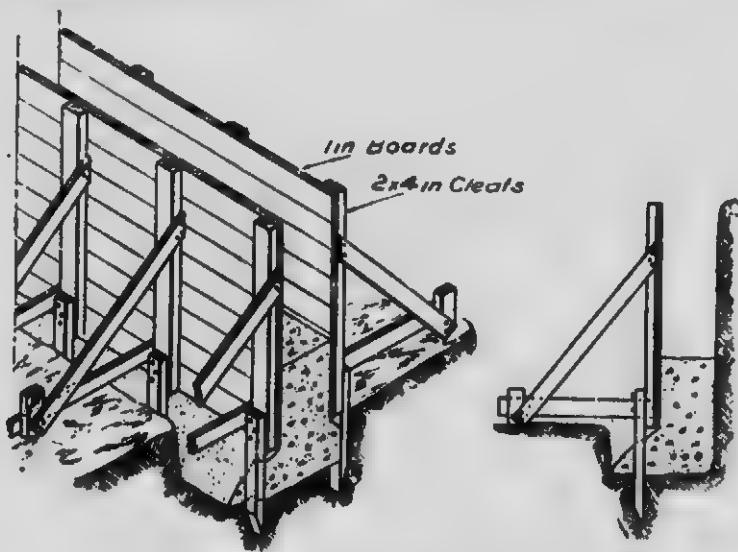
FORMS FOR CONSTRUCTION OF BASEMENT WALL.
